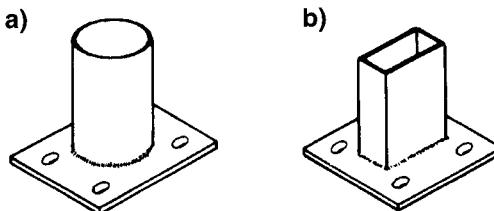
Single leg column welded to base plate a) CHS b) RHS
